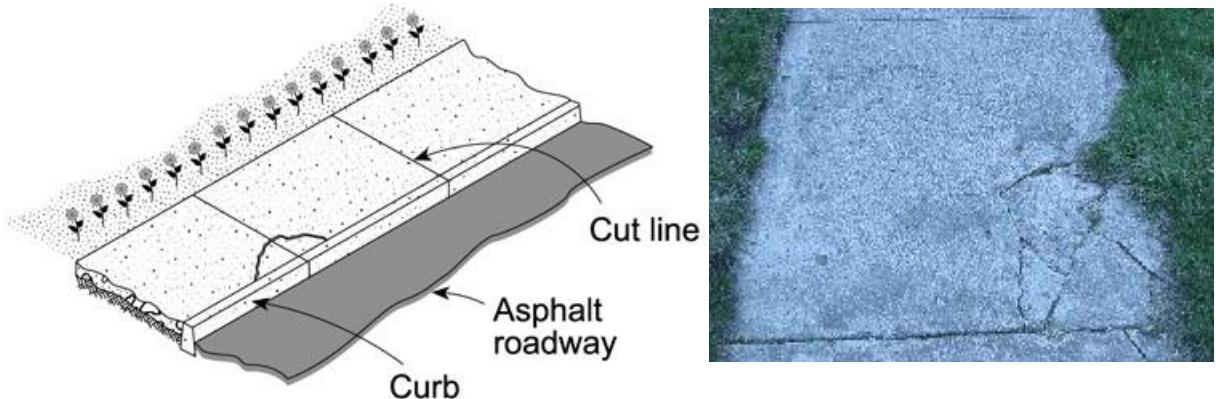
Corner Cracking of Concrete (<http://irc.nrc-cnrc.gc.ca>)
